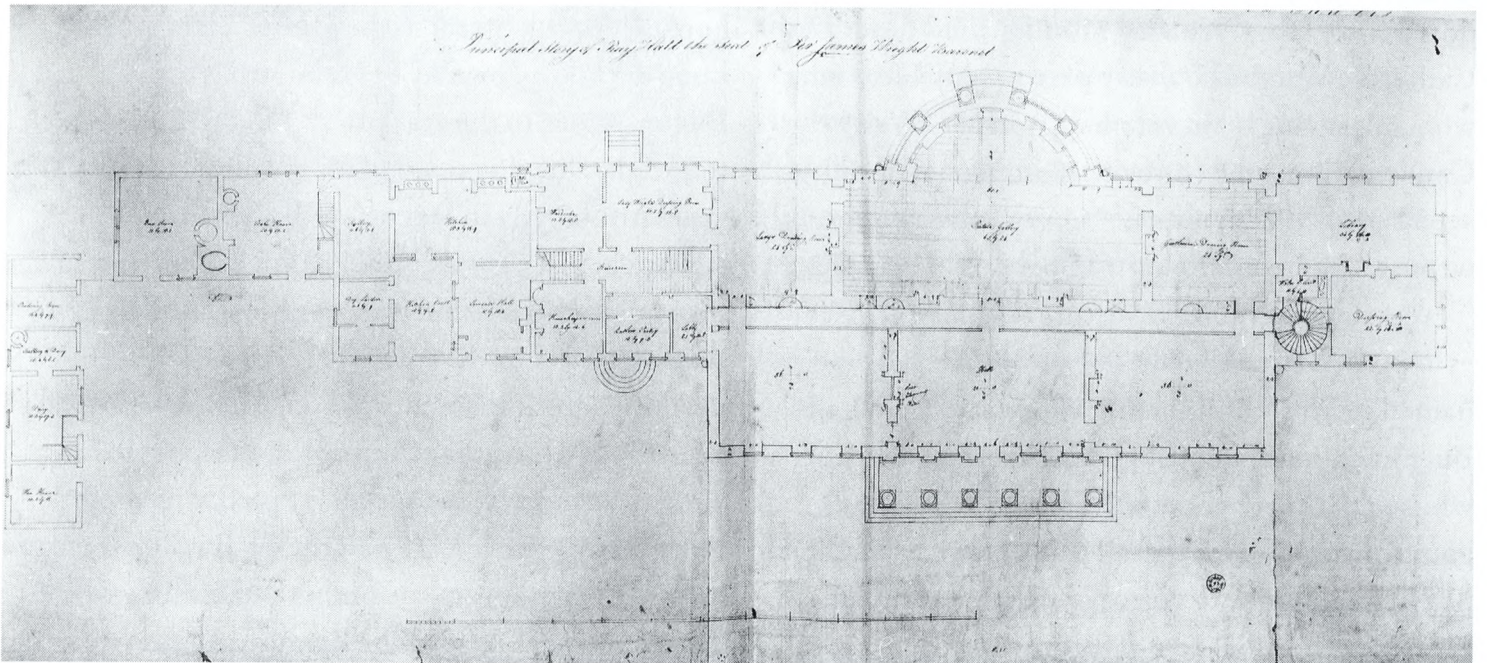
Robert Adam, ground floor plan (part survey, part proposal) of Ray Hall, c.1773. *Sir John Soane's Museum.
